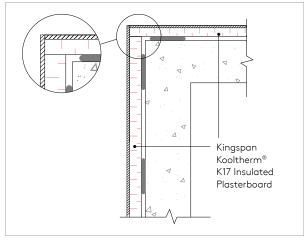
Insulated reveal and external corner with Kingspan Kooltherm® K17 Insulated Plasterboard.
